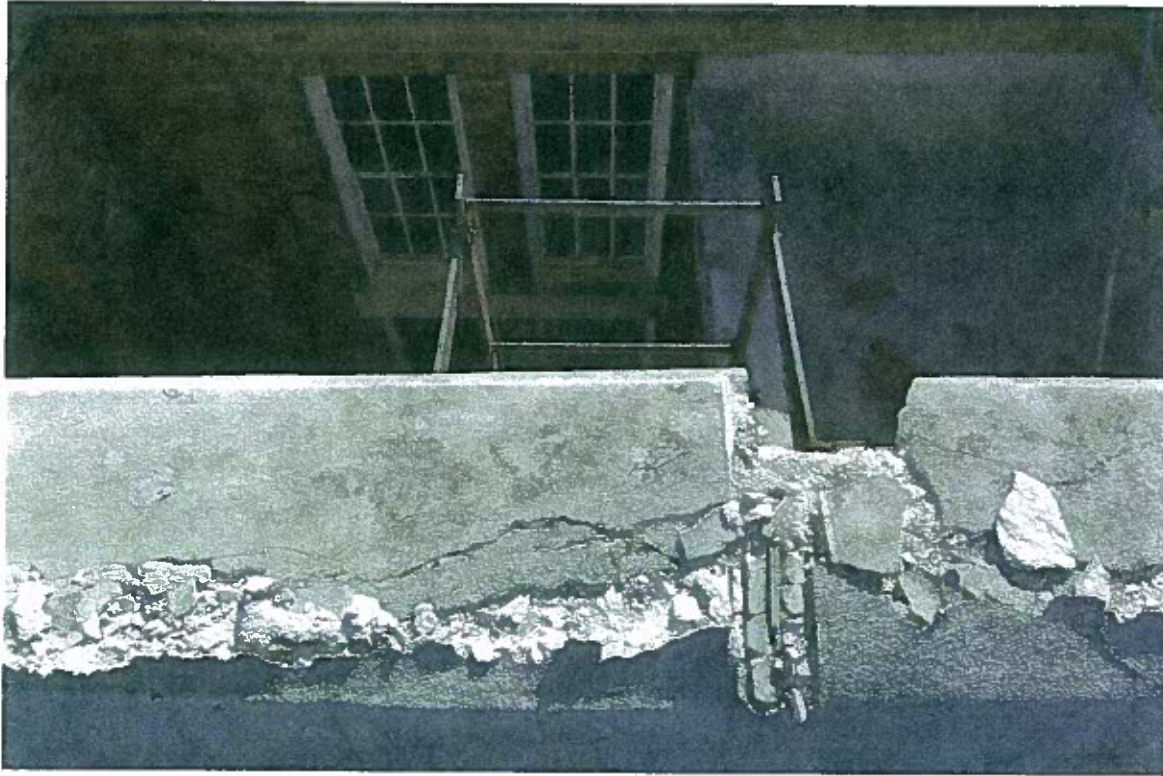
Spalling and cracking of Indiana limestone parapet from moisture trapped by the roofing membrane running up and over the coping.
